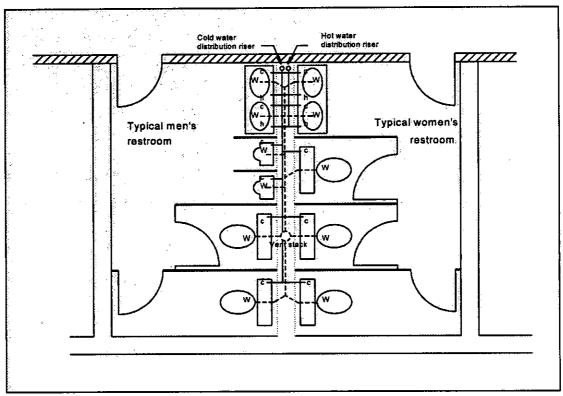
Proposed back-to-back structural and piping layout. Grosskopf, Kevin R. Water Reclamation and Reuse Within Multi-Level Structures. University of Florida: 1993
